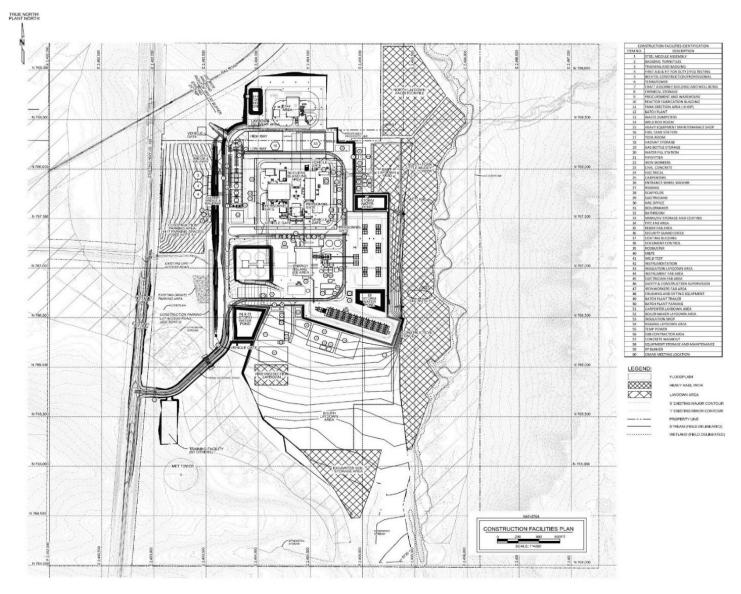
Kemmerer Unit 1 Site Construction Layout. Source: TerraPower 2025-TN11595.
